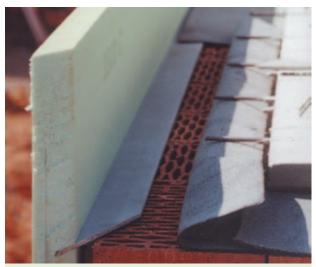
Formwork for ceiling edges with Styrodur 2800 C.
